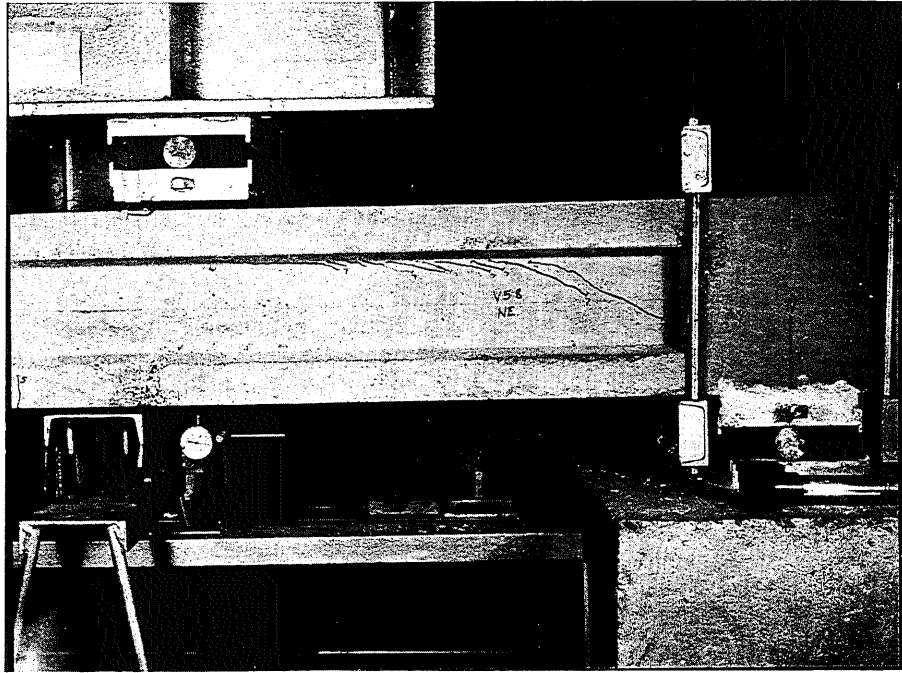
SECONDARY INCLINED TENSION CRACKING
